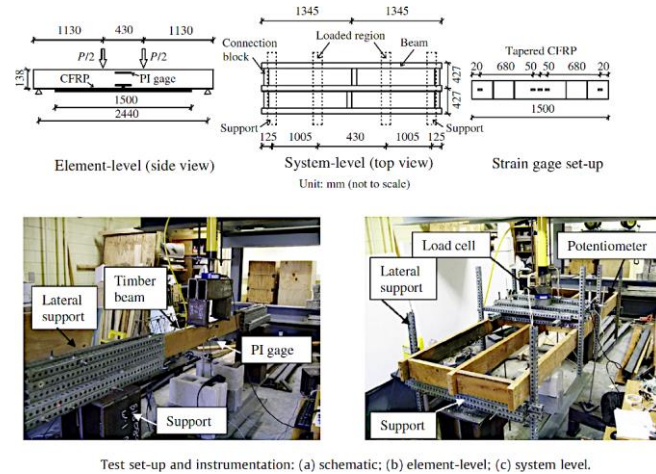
Test setup for single joists and floor assemblies (Kim et al. (2013b)).
